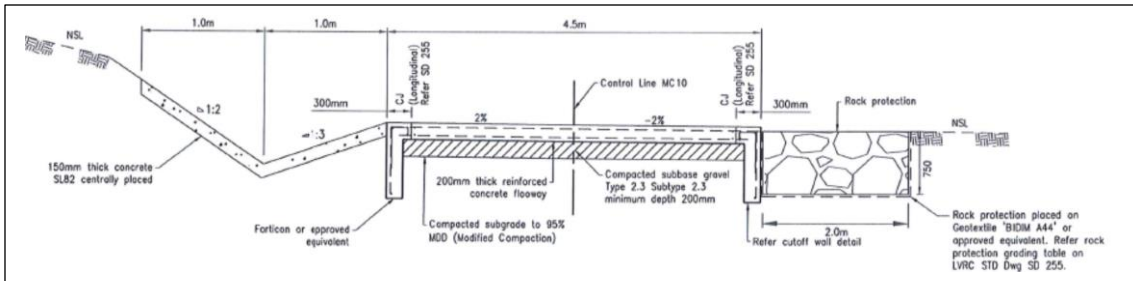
TYPICAL CROSS-SECTION FOR SECTION A [18]
